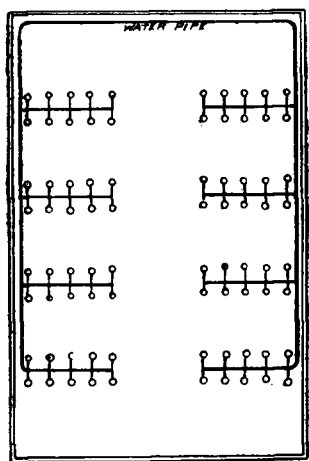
SKETCH-PLAN OF BATH-ROOM, SHOWING ARRANGEMENT FOR EIGHTY SHOWERS.
